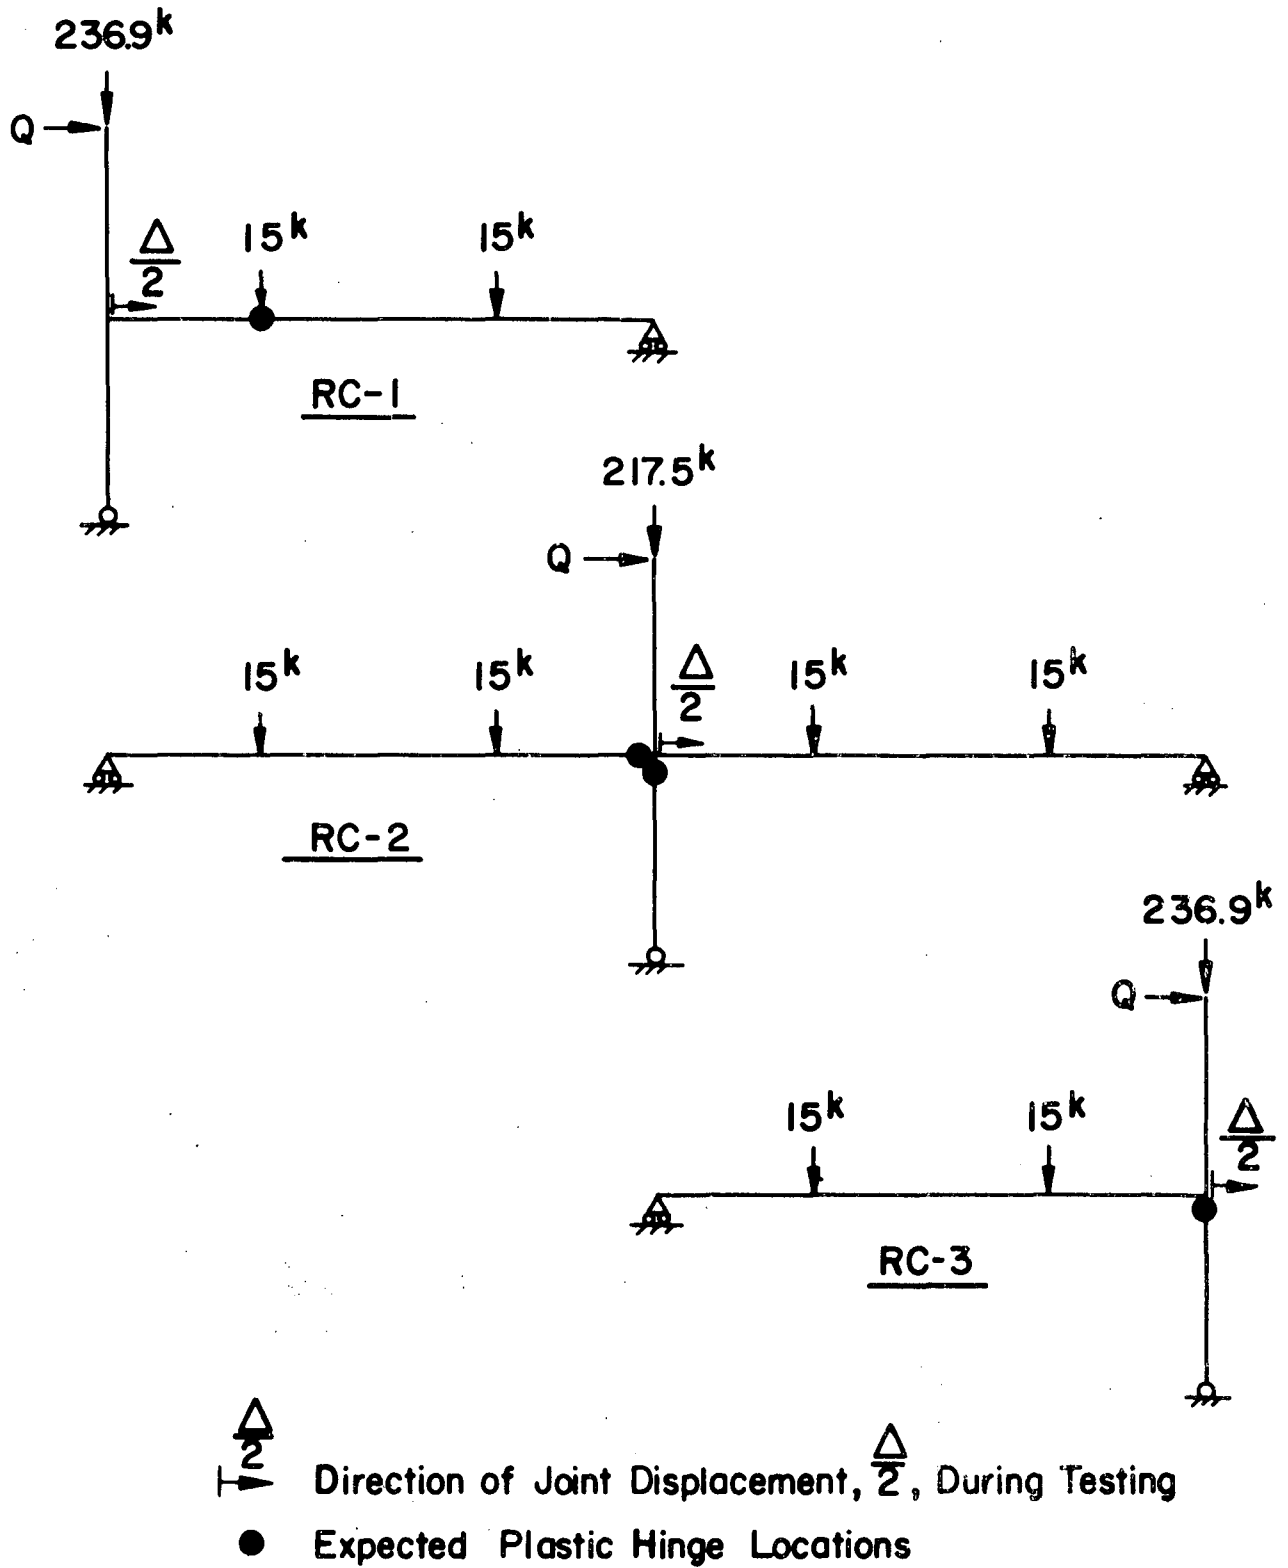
LOADING AND EXPECTED PLASTIC HINGE LOCATIONS FOR EACH TEST SPECIMEN
